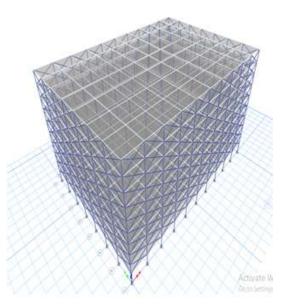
3D view of bare frame Structure with bracings at outer Periphery.
